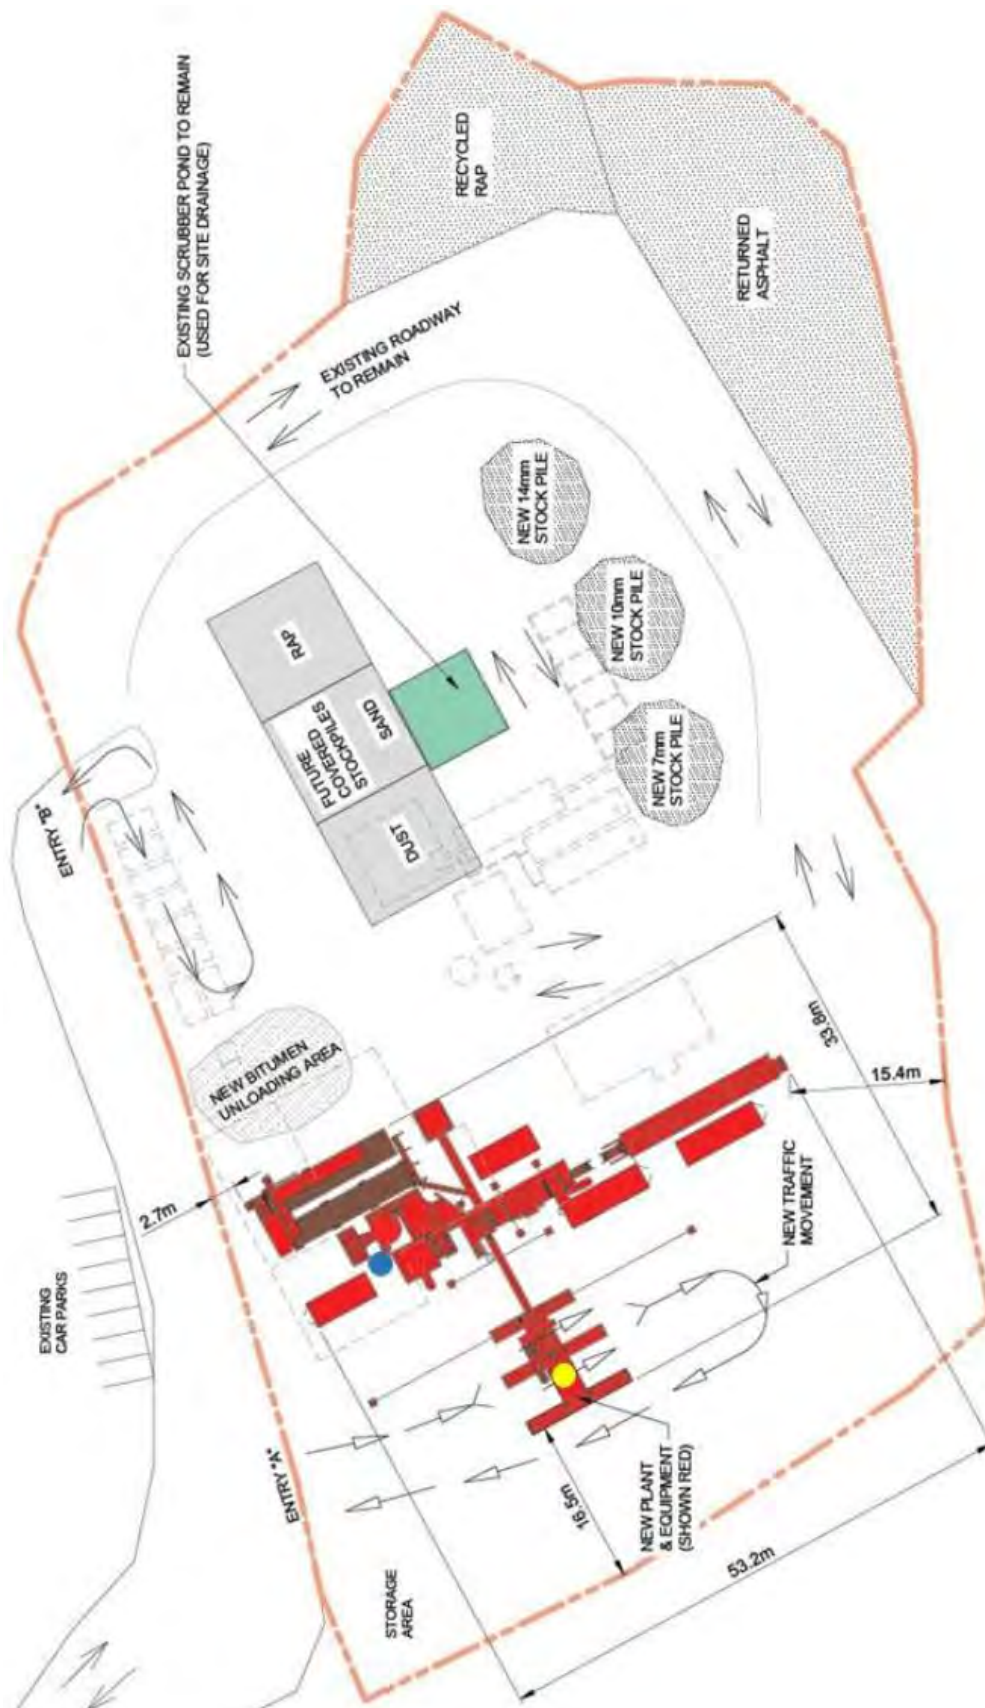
Site plan showing proposed infrastructure in relation to the existing site layout (from Drawing 1359-006 Appendix B of the EER)
